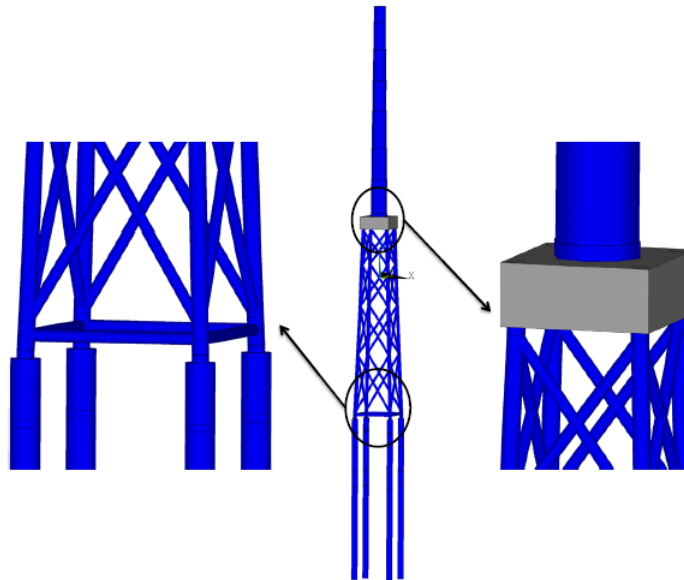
Jacket with tower and piles (middle), concrete TP (right) and pile heads in detail (left) [Vorpahl et al., 2011]
